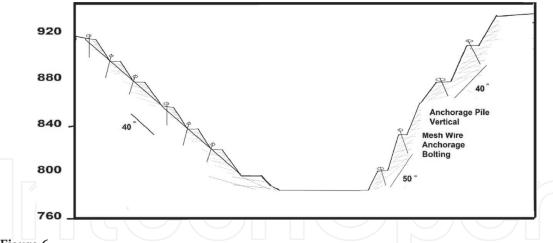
North and south steep slope faces of Avgamasya No. 1 pit of Şırnak asphaltite coal mine site and survey area with anchorage pattern.
